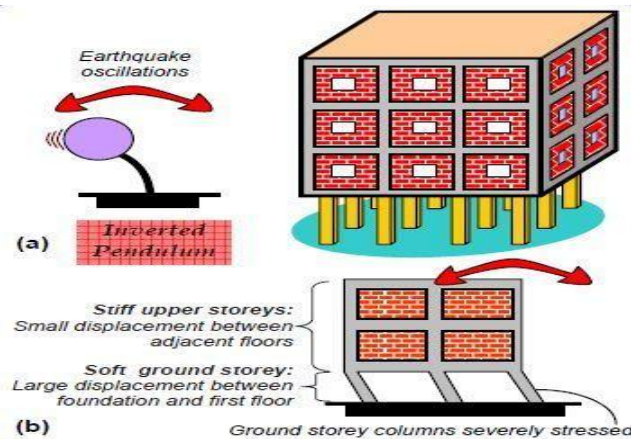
Upper storeys of open ground storey building move together as a single block – such buildings are like inverted pendulums.
